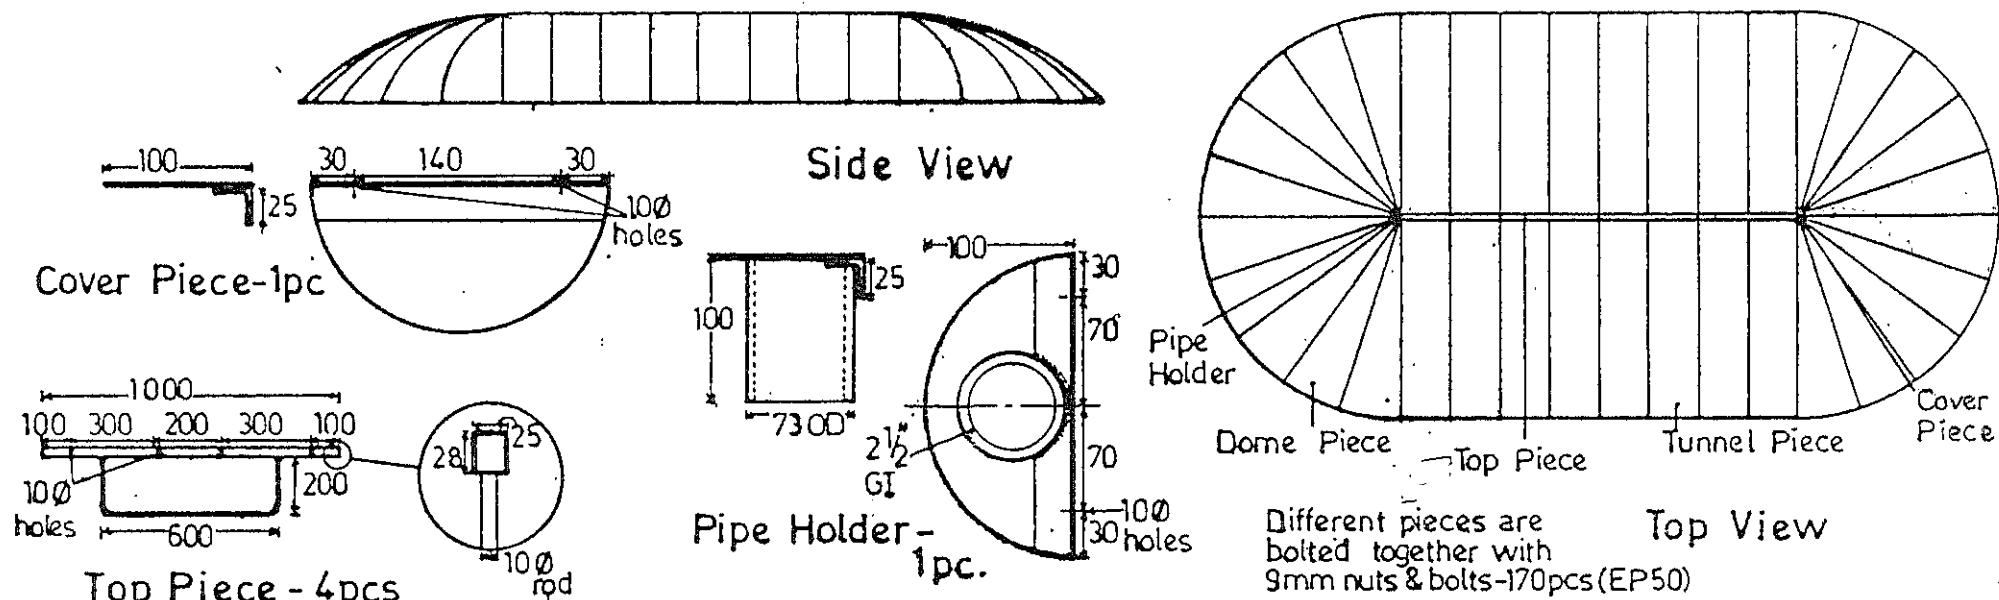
Steel Mould for Extended Dome Biogas Plant
